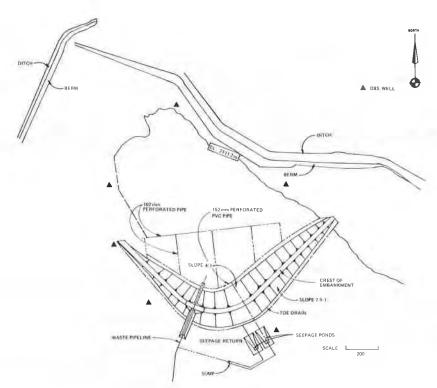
PLAN OF FGD POND AND UNDER DRAIN SYSTEM
